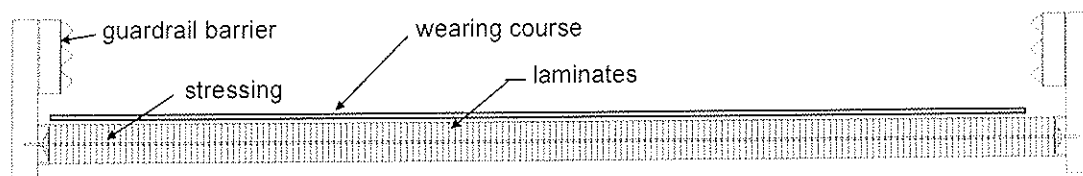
Section through a Stress Laminated Timber Plate Bridge Deck
